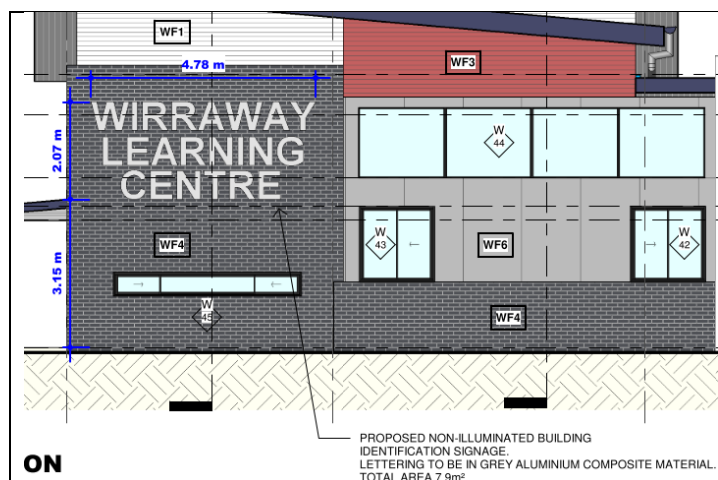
Proposed school main building sign (Source decision plans south elevation drawing)
